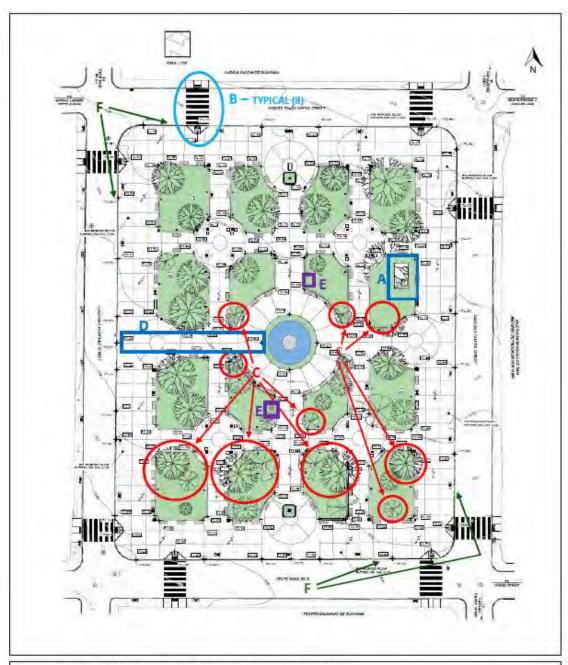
Proposed pedestrian crossing site plan and access ramp location (Source: 90% Construction Document, Share Tech Group Engineering. P.S. C., drawing number AD-202).
